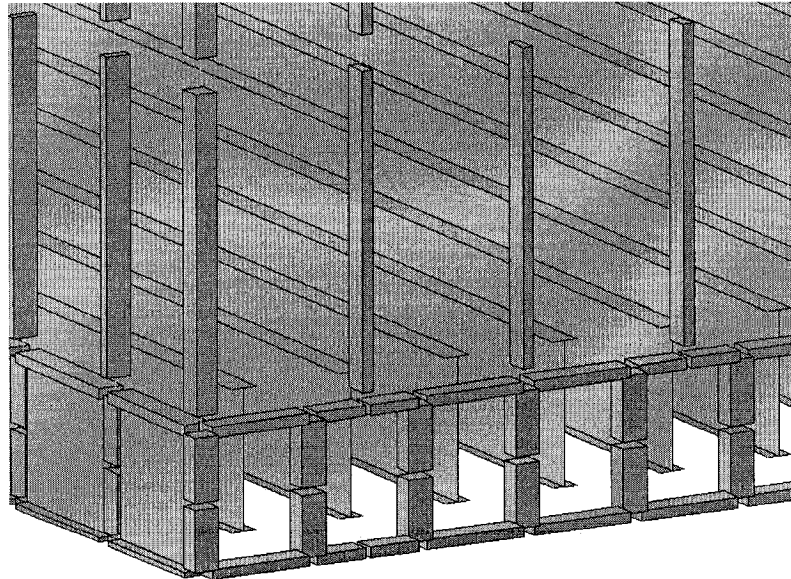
Finite element model floor system (studs and I-Joists elements)
